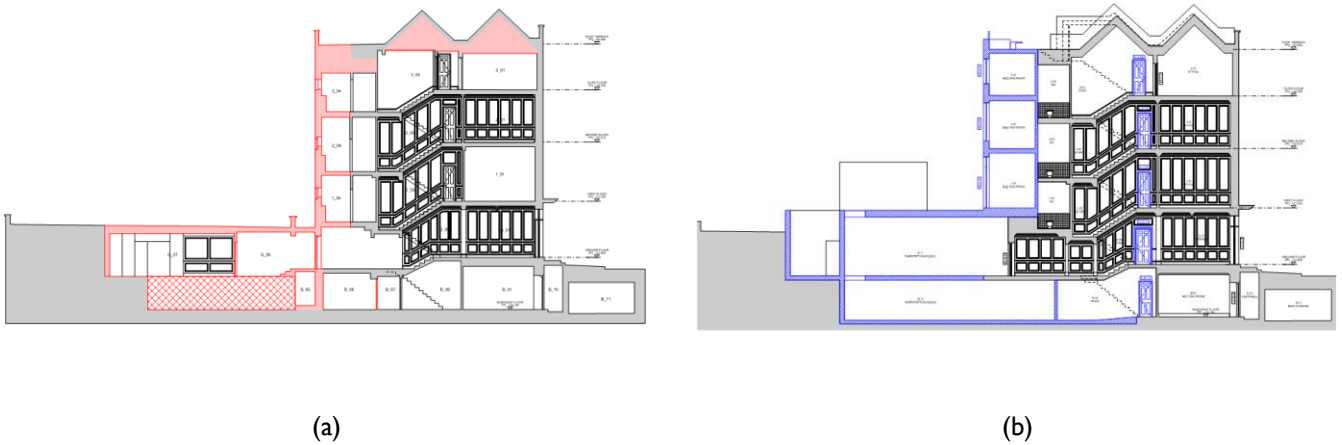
Owen Architects cross section CC - (a) Existing (red indicates excavation and demolition areas) and (b) proposed (blue indicates new structural components) building layout.
